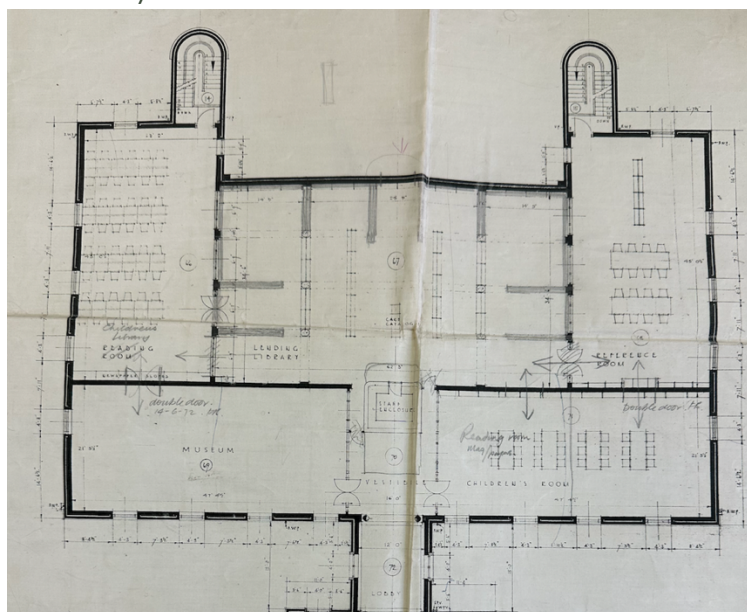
Plan dated 1938 showing the proposed layout of the new library (© Uxbridge Archives)
